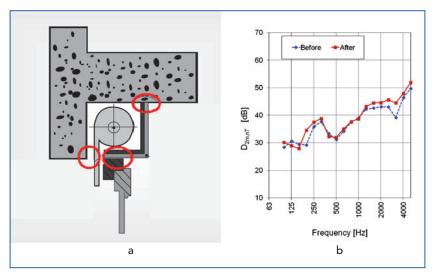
a) Leakages between shutter box, wall and window frame, b) Case study: façade insulation before and after sealing between shutter box and wall.
